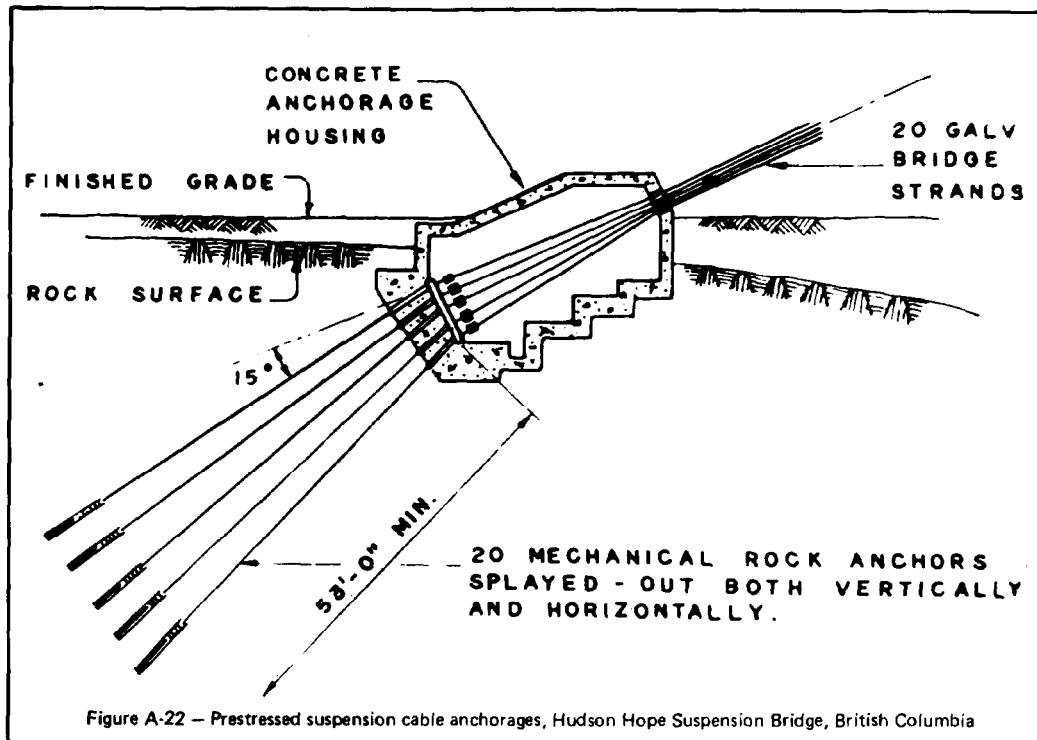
Prestressed suspension cable anchorages, Hudson Hope Suspension Bridge, British Columbia
